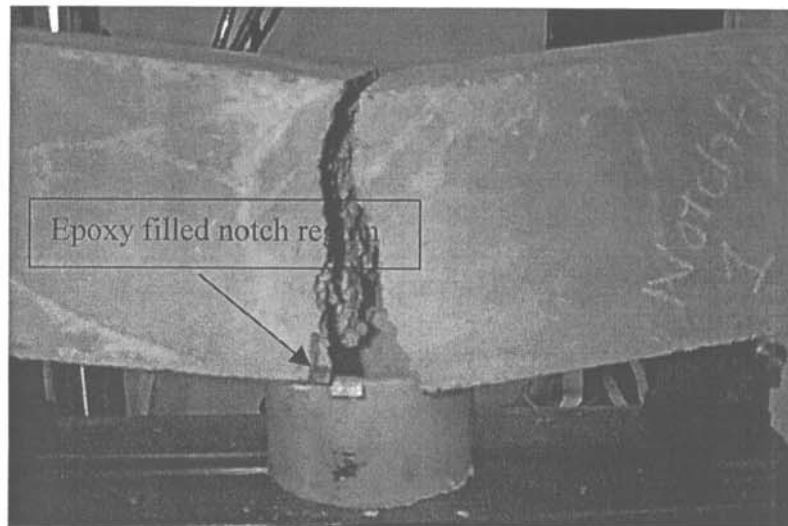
Failure pattern of the epoxy filled notched-concrete beam.
